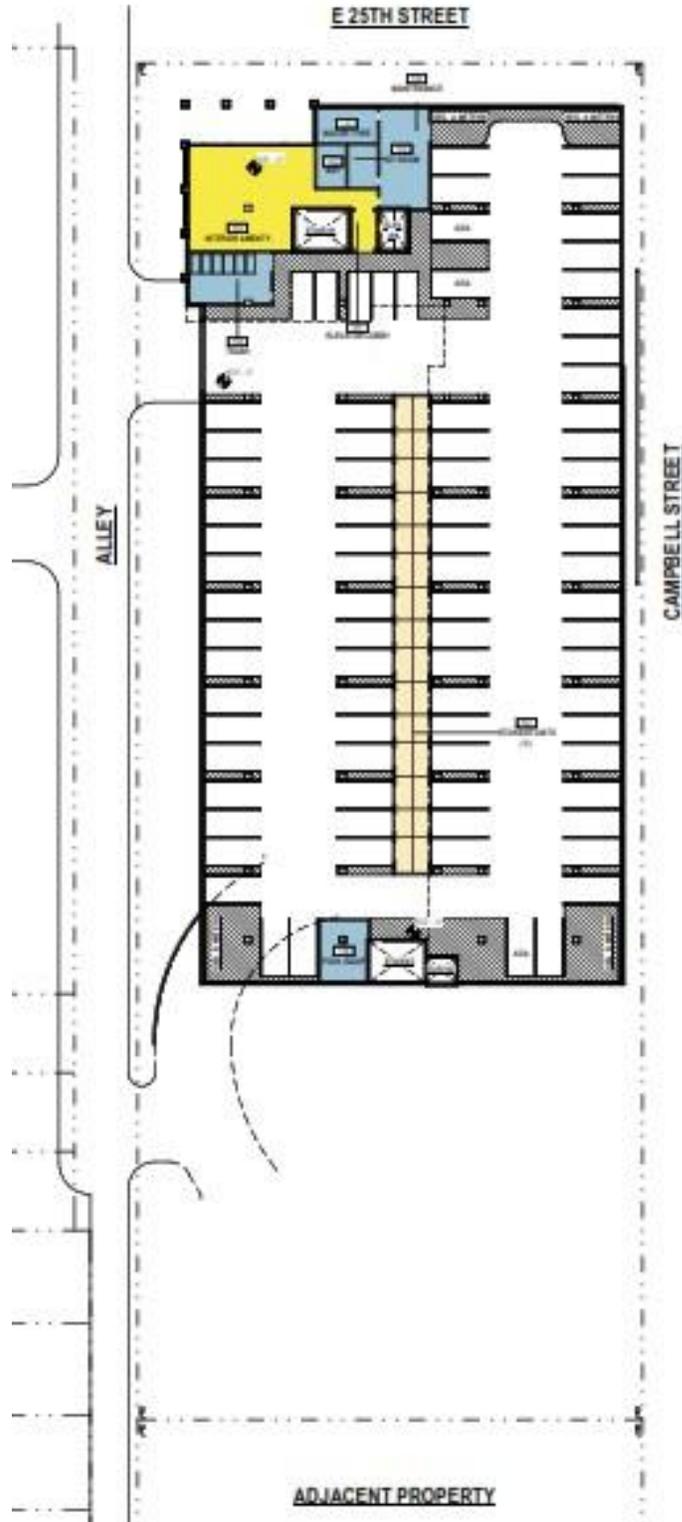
Proposed Site Plan, Level #2. Courtesy DRAW Design & Architecture.
